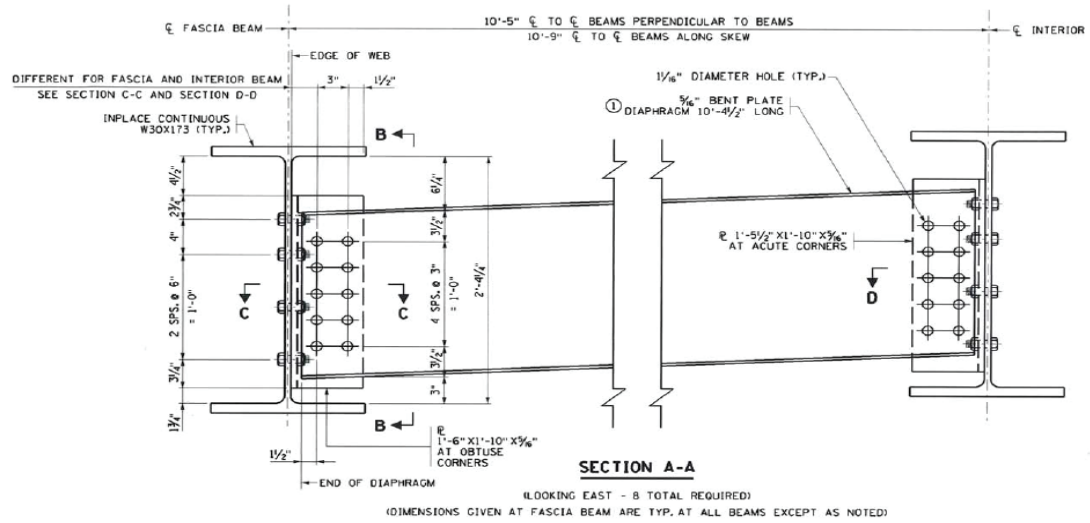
Elevation view of new bent plate bracing element (Minnesota DOT)
